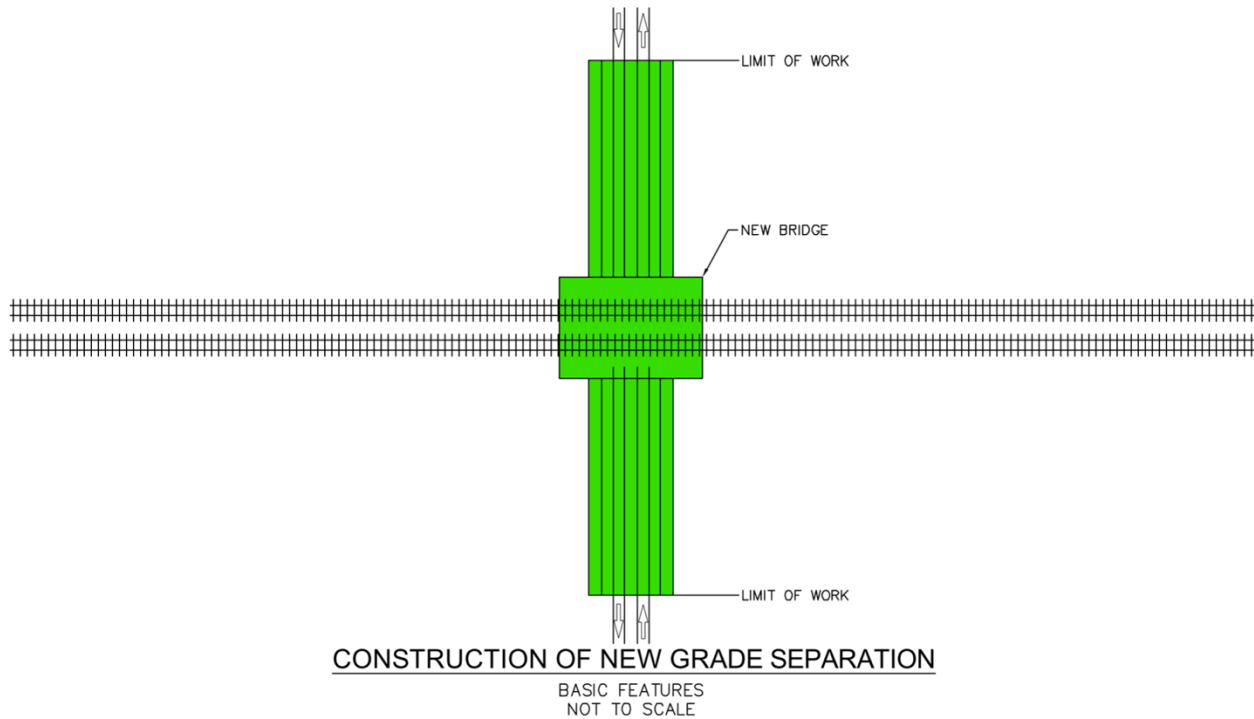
Typical Configuration – Construction of Grade Separation Improvements
